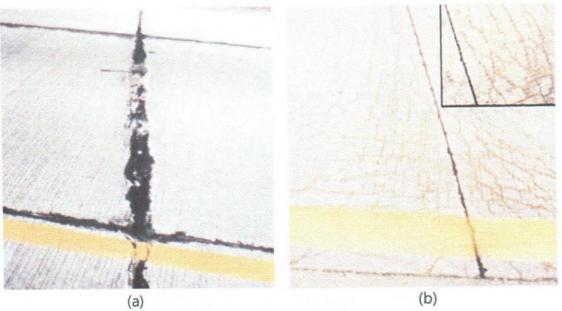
a) Frost damage (crumbling) at joints of a pavement. b) frost indued crack near joint.
